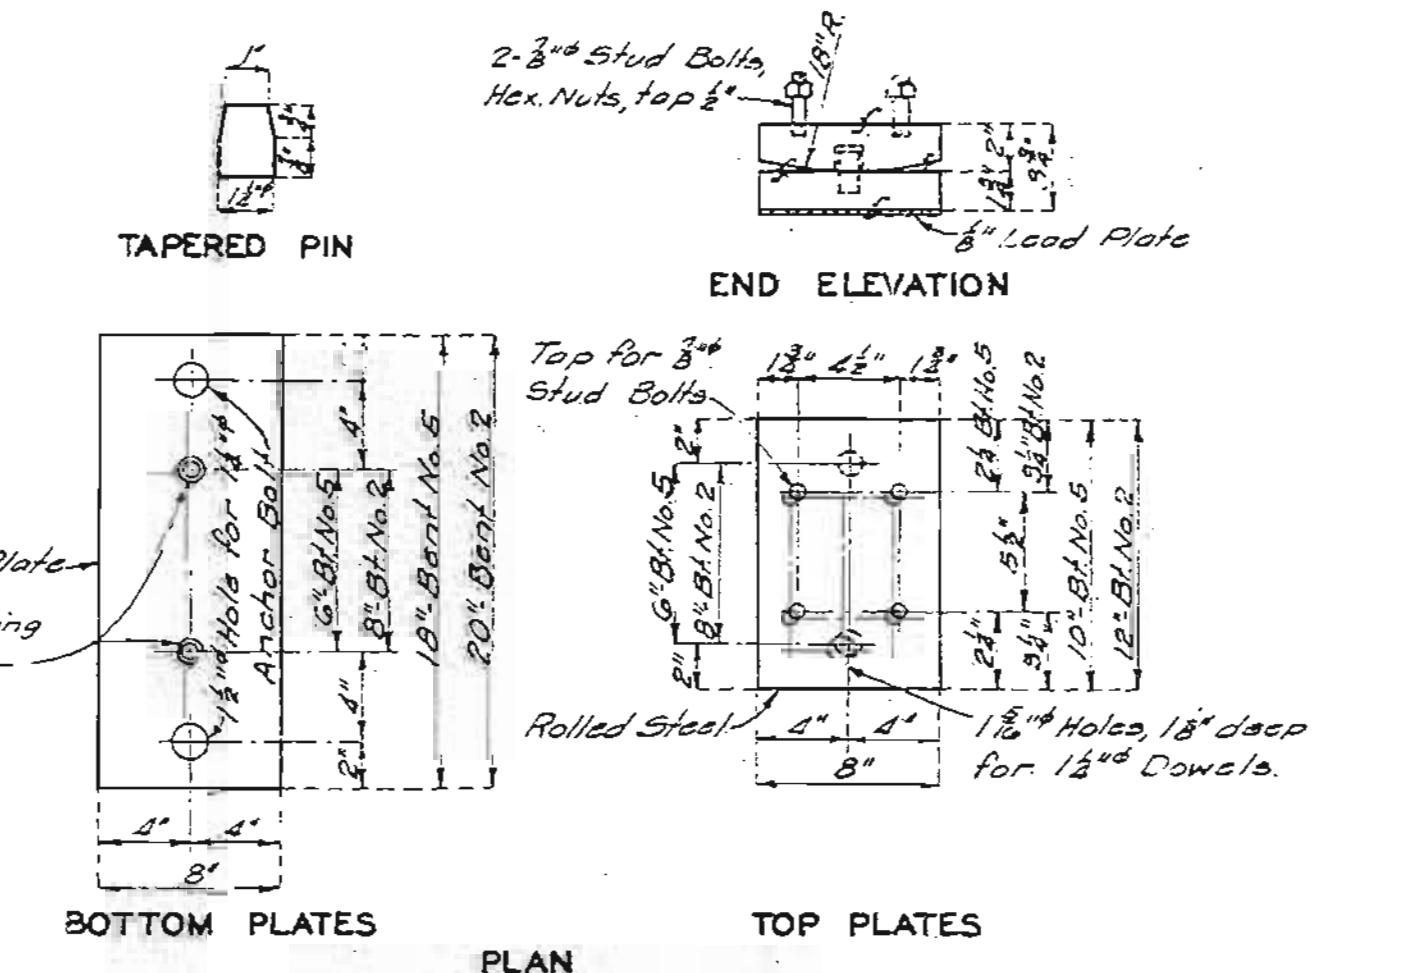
DETAILS OF FIXED SHOES FOR TRUSS SPAN AT PIER NO. 4 (2 Sets Required)
